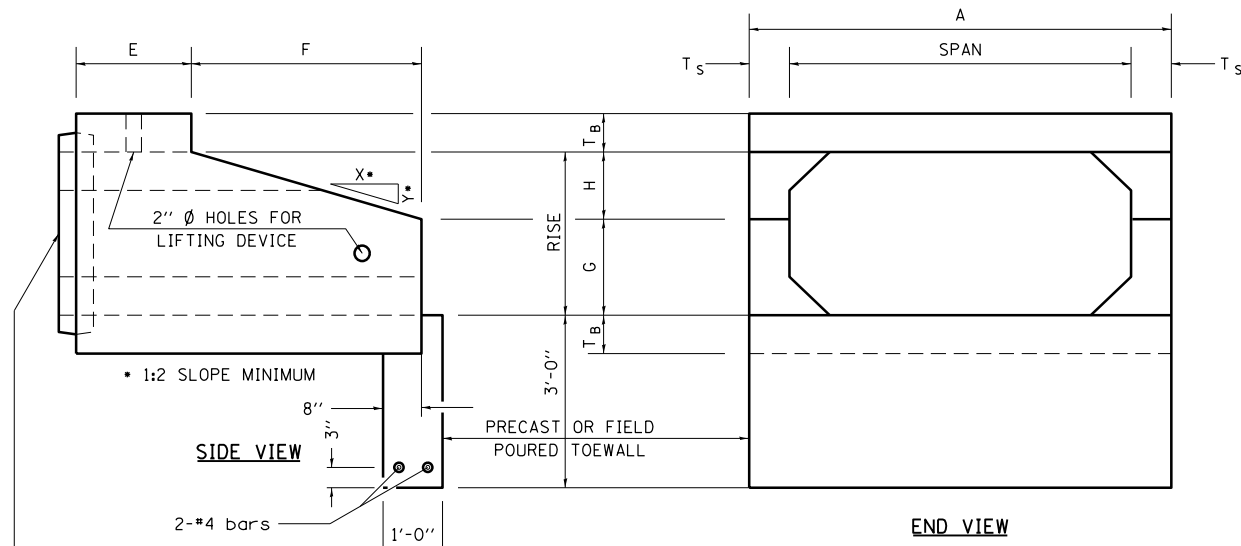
DETAIL OF PRECAST CONCRETE BOX CULVERT END SECTION
